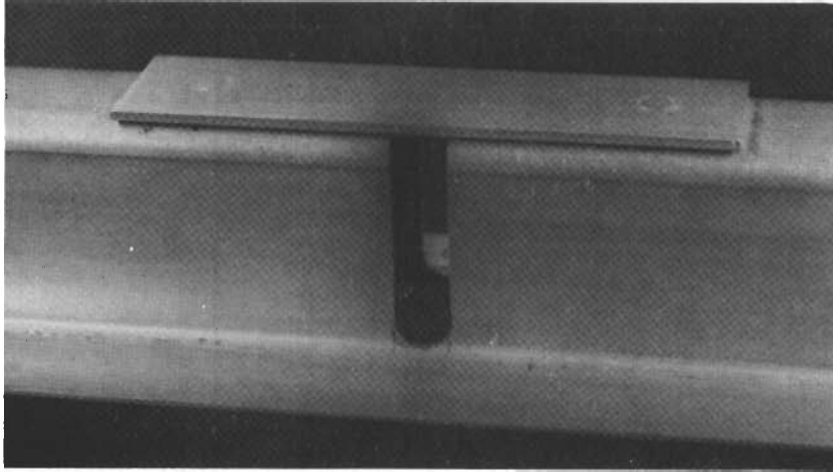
THE COUNTERSUNK RIVETTED JOINT IN THE TEST BEAM
